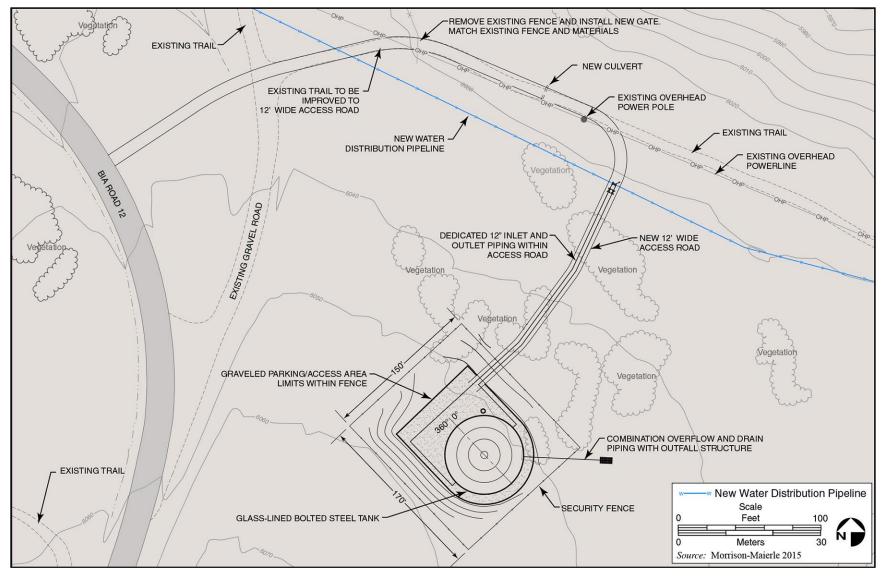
Construction Plans for the Proposed Cibecue Ridge Tank
